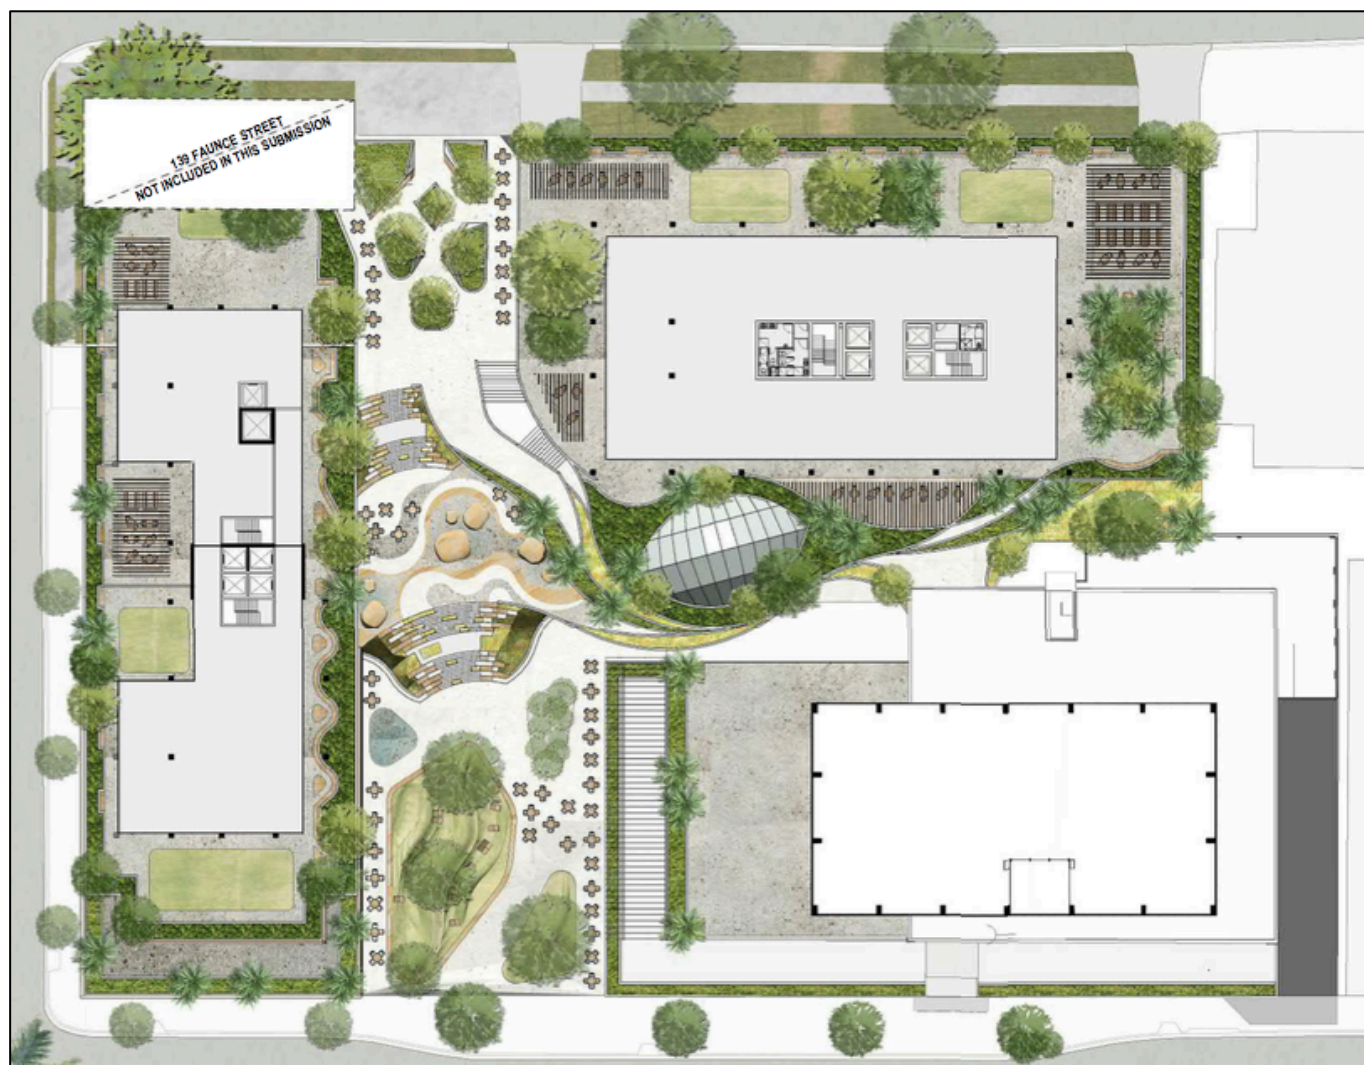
Concept Landscape Masterplan (source: Contour Landscape Architecture)
